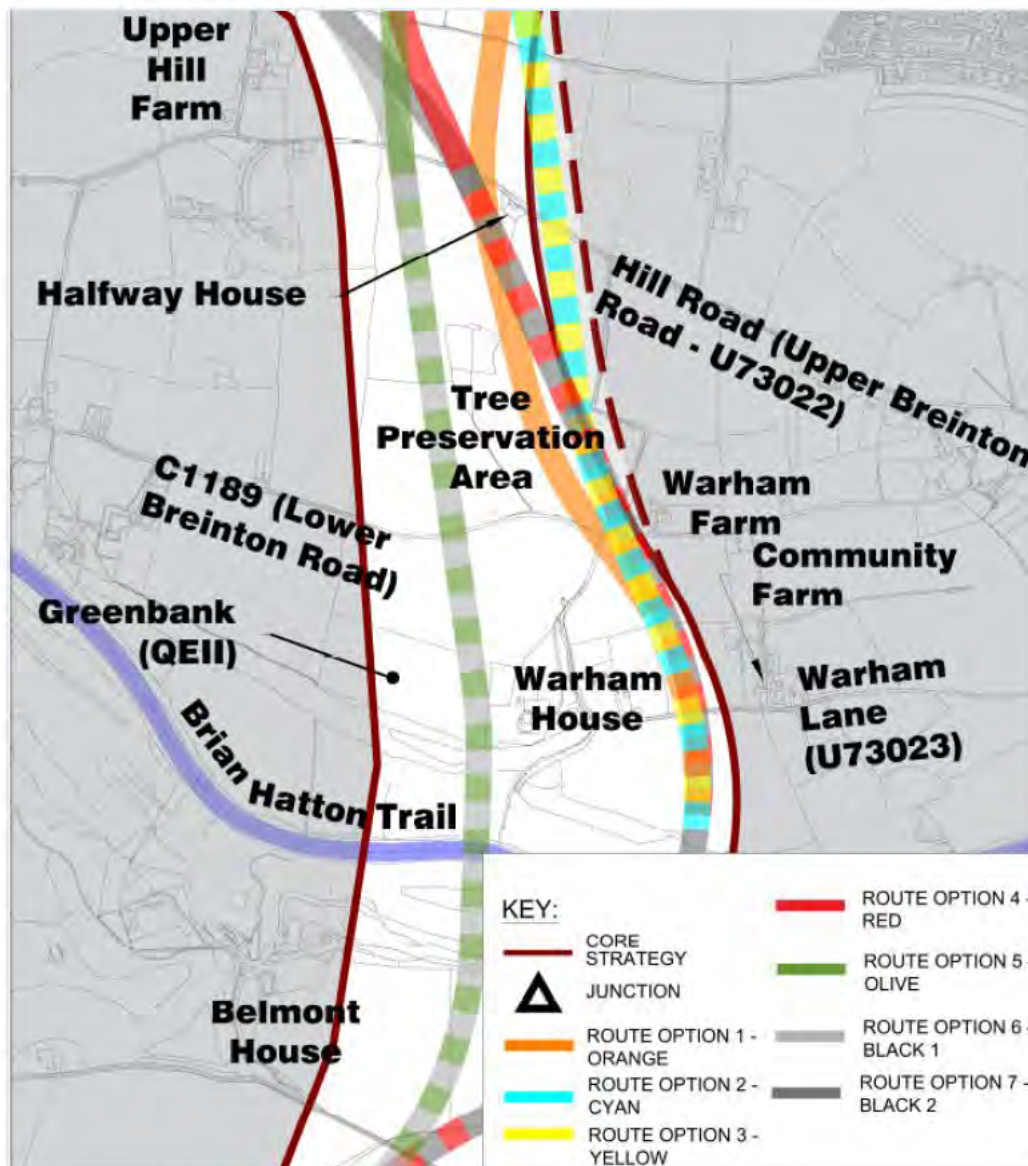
Sub-element 1.3. Warham Lane (U73023) to Hill Road (Upper Breinton Road – U73022)
